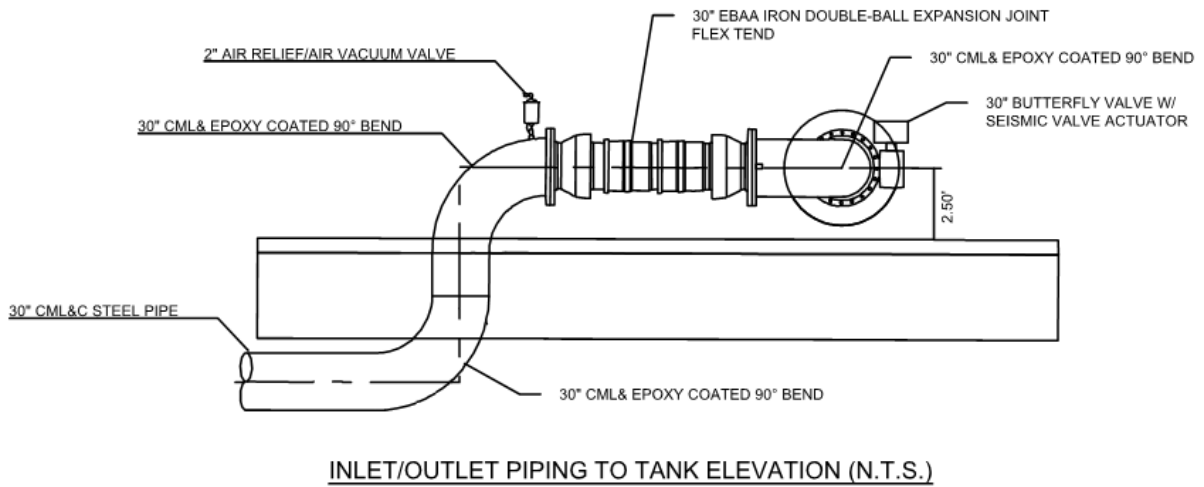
Inlet/Outlet Piping to Tank (Elevation)
